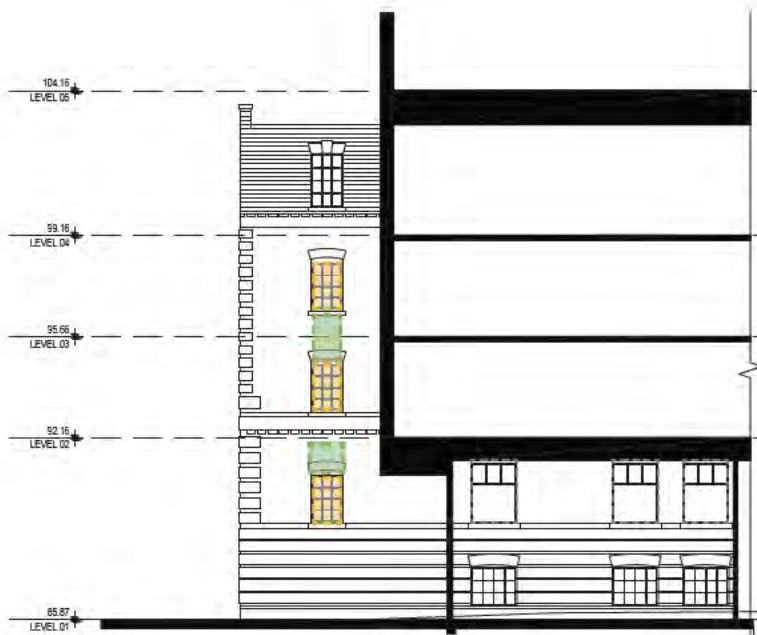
Proposed north elevation and partial section showing extend of modified openings (Wallman Architects, 2024; annotated by ERA).
